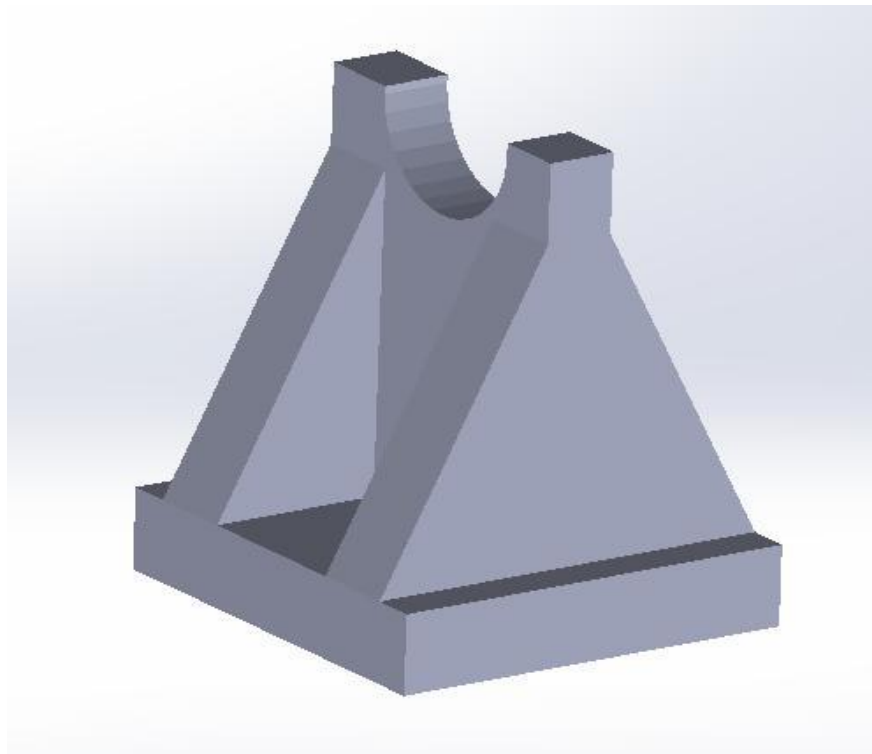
The 3D Printed Filament Rebar Chair used as Concrete Cover
